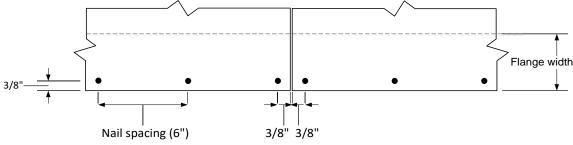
Non-staggered nails at diaphragm boundaries (see Footnote g), not to scale.
